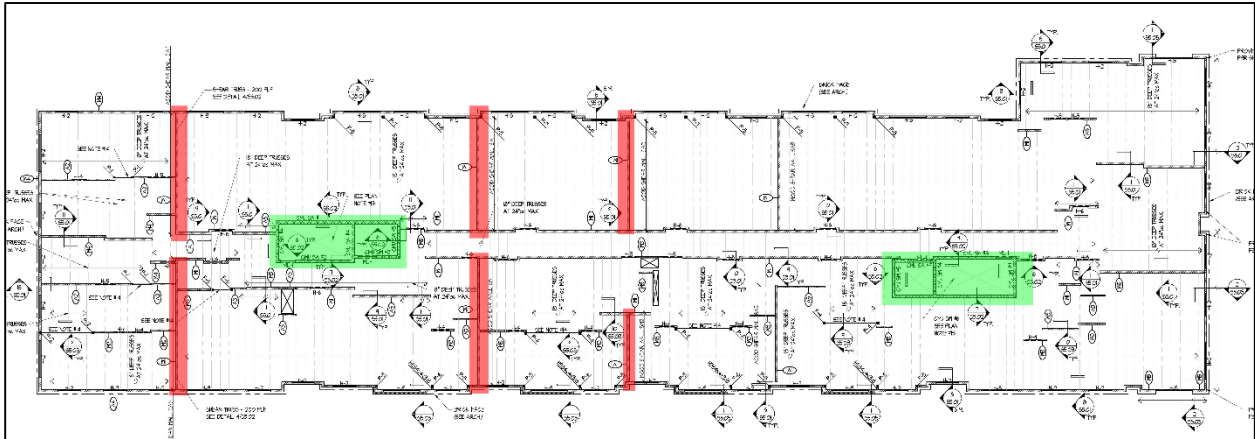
Typical Floor Plan, Floor 2 through Floor 5
